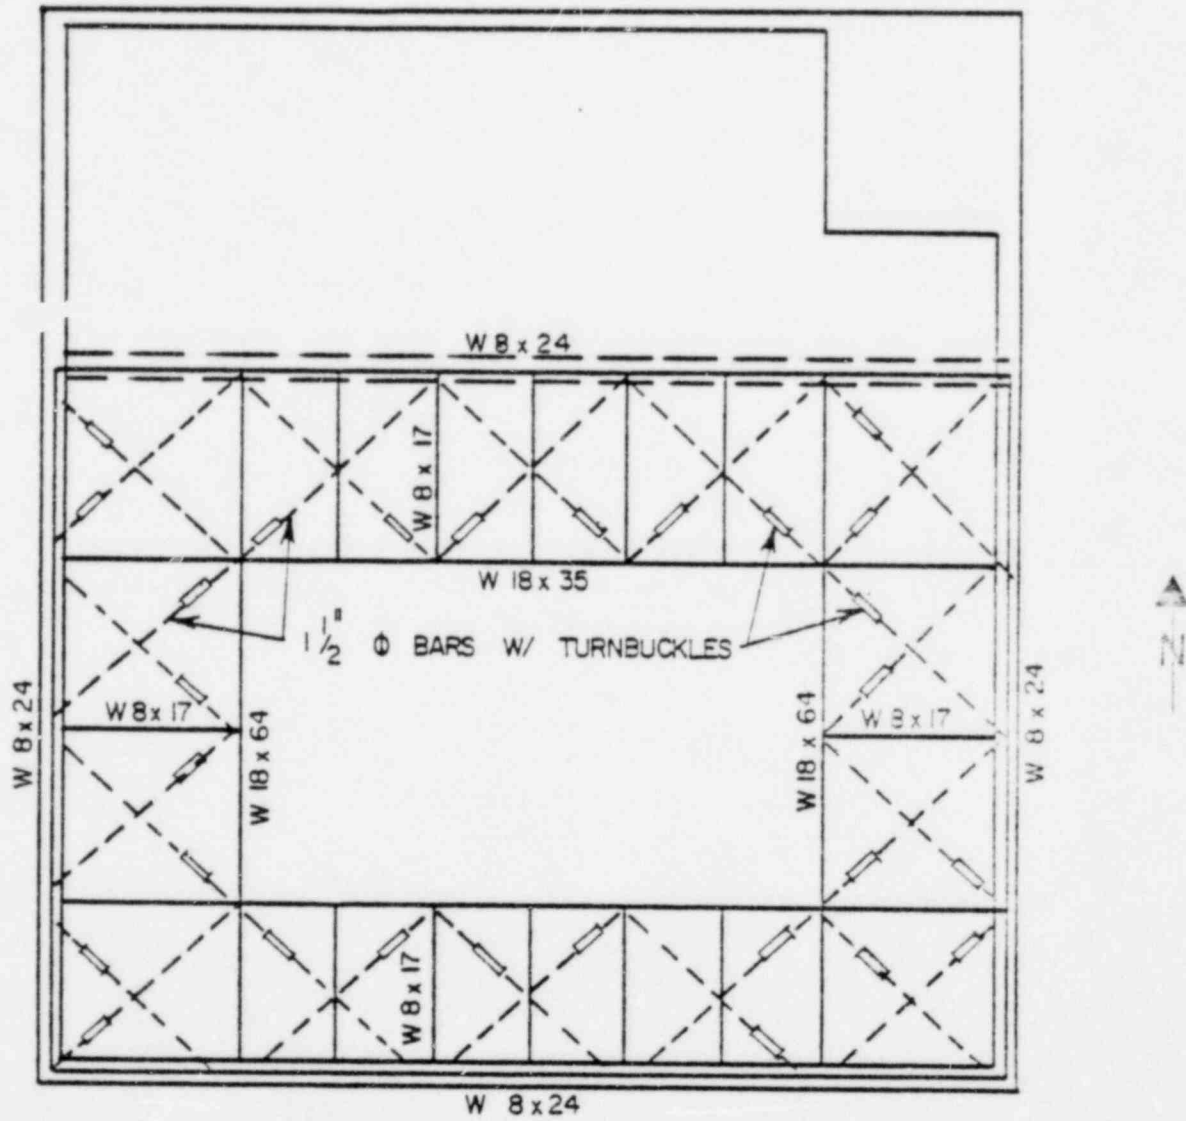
INPLANE ROOF TRUSS FRAMING PLAN
